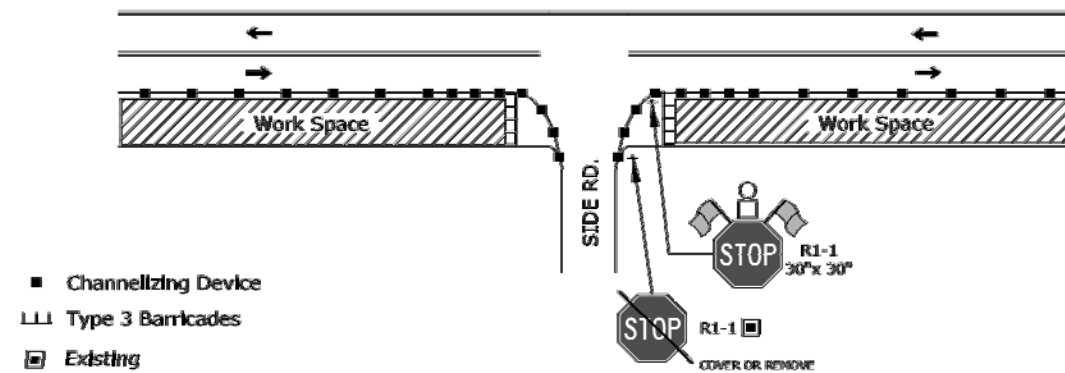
SIDE ROAD OR ENTRANCE OPEN THROUGH WORK AREA
